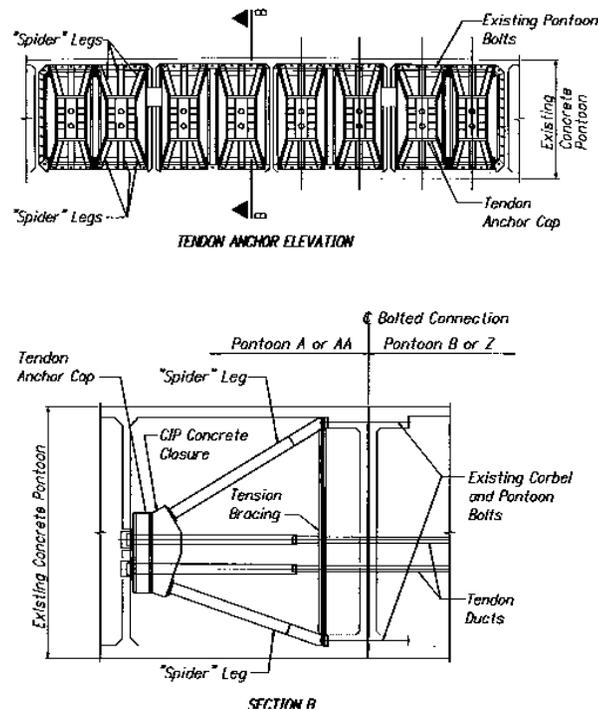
The top sketch is a full width section of the bridge at the tendon anchor location. The section below shows the “spider” anchor.
